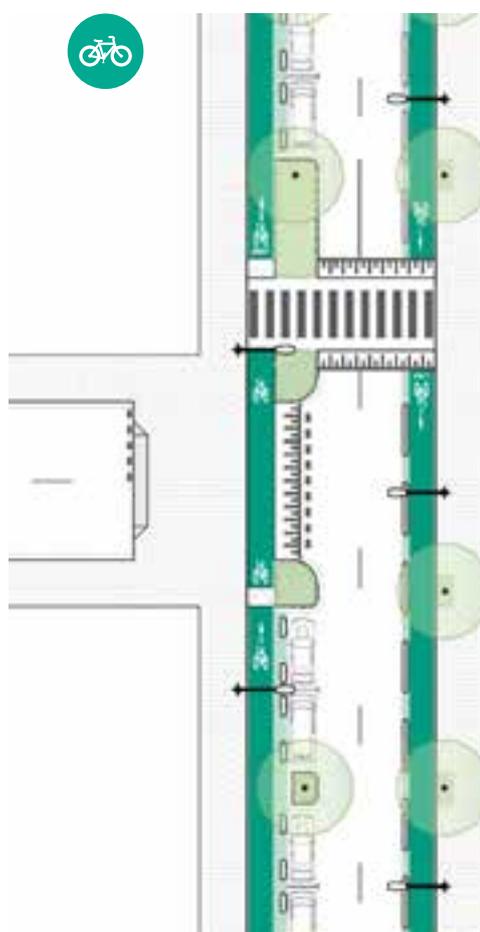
Bicycle path (one-way), continuous cycleway raised intersection - plan
